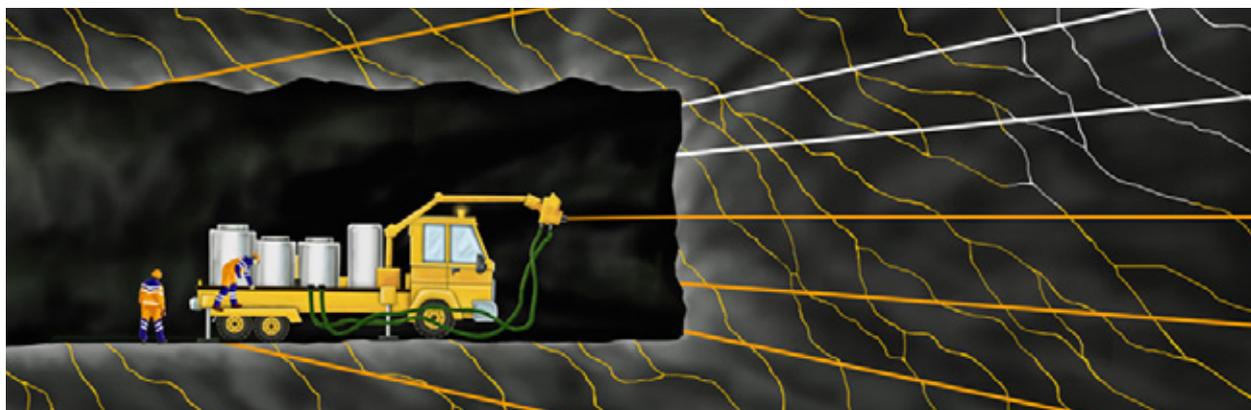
Pre-grouting. The grouting rig pumps cement with high pressure in the drilled holes. By doing this all waterborne fractures becomes sealed [7].
